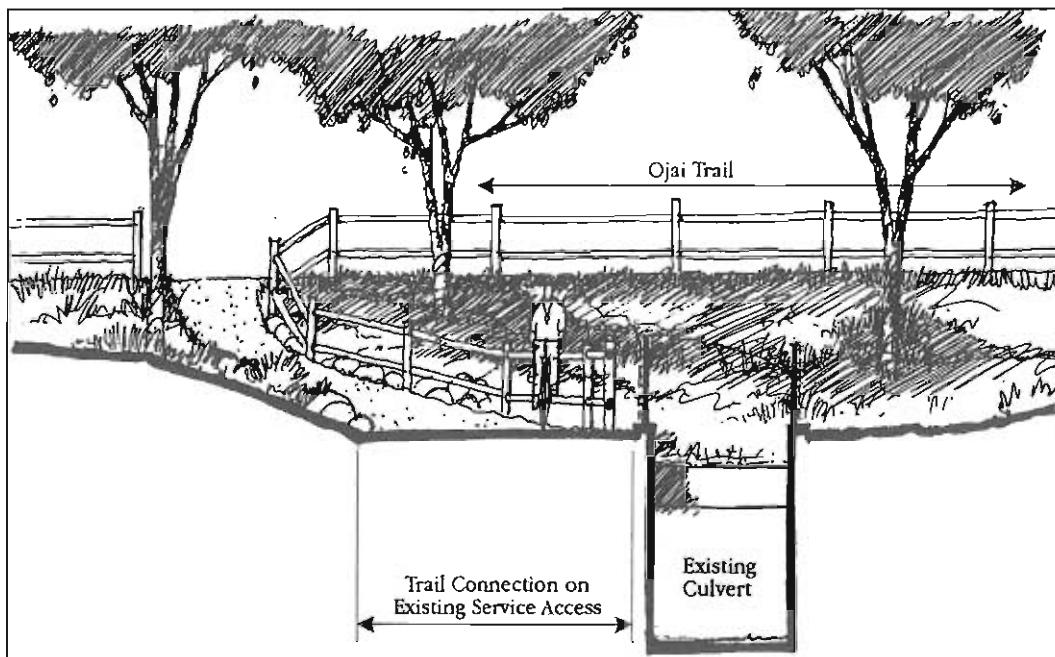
Lateral Trail Access from Ojai Avenue at Existing Culvert Parallel to Canada Street
